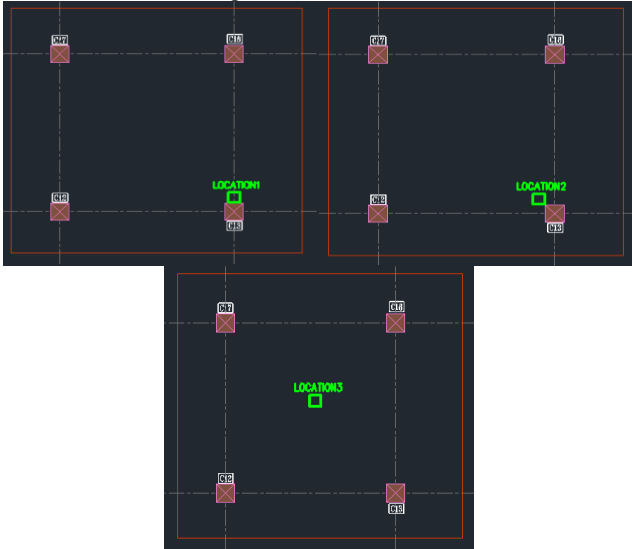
Plan view of opening location for case 1, case 2 & case 3
